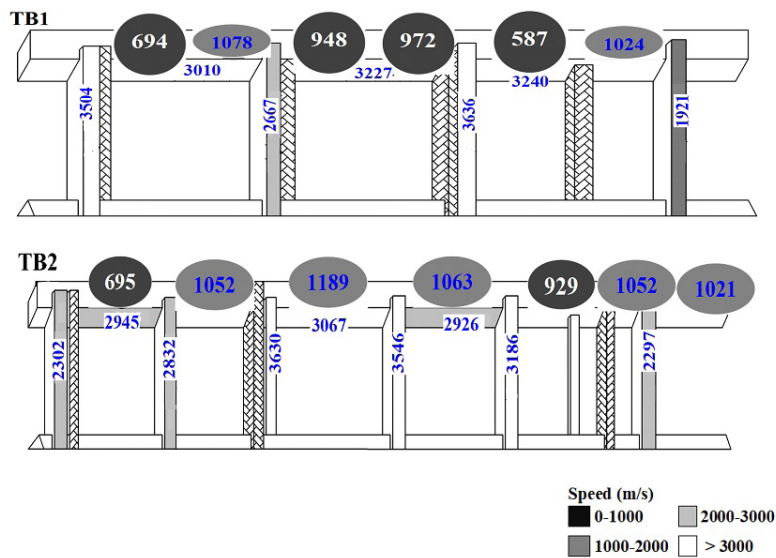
WS in wood of truss (see Fig. 1 for more details)..
